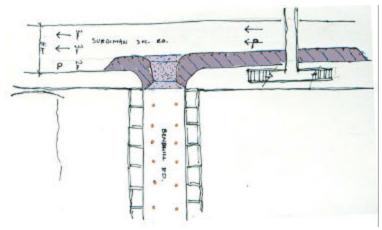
Graphic of Proposed Widened Sidewalk at Benhil
